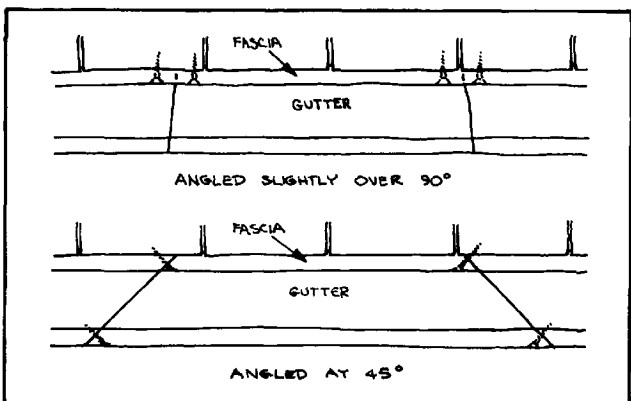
Two ways to cut and replace a section of gutter, viewed from above. The upper version, with angle cuts slightly over 90 degrees, will allow more convenient replacement.
